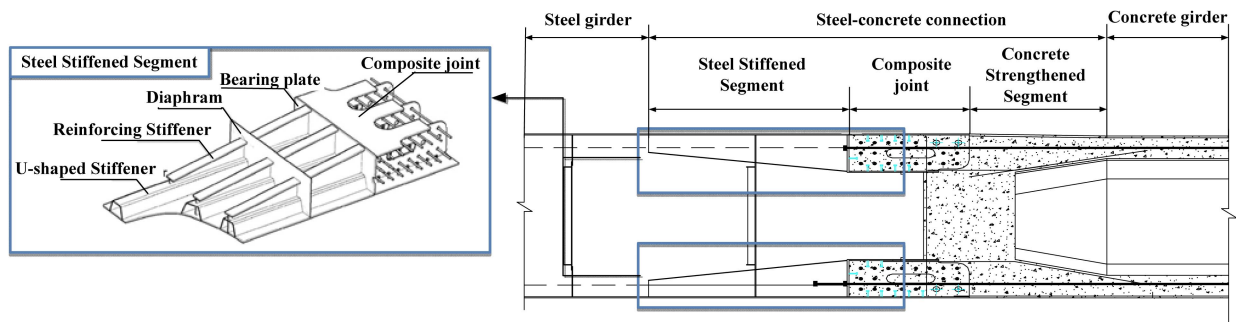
Scheme of steel concrete connection and steel stiffened segment.
